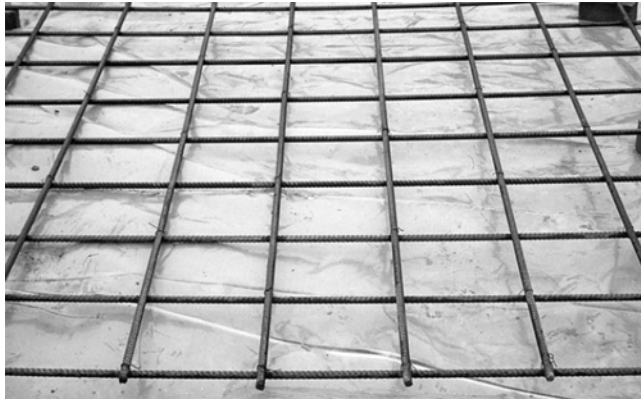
Reinforcing bar in concrete slabs placed directly on vapor retarder help to control slab curling and cracking. Supported deformed bars no smaller than No. 4 (No. 13) should be used, and the bars spaced far enough apart so workers can step between them (Holland and Walker 1998).
